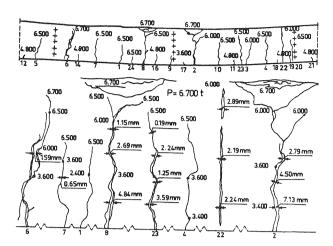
The behaviours of the girder under a load of $\,^{\rm P}\,$ 6.7 t. the positions and width of cracks (A reduced copy from 1/5 original plotting).
